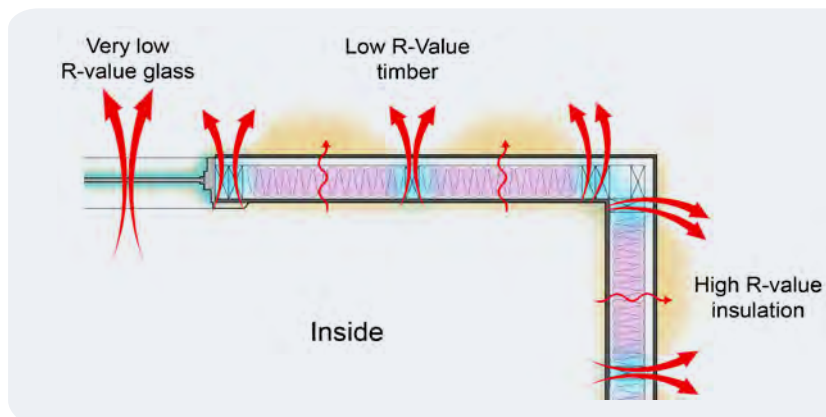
Timber-framed wall. Conventional timber framing with insulated cavities will still give some thermal bridging.
